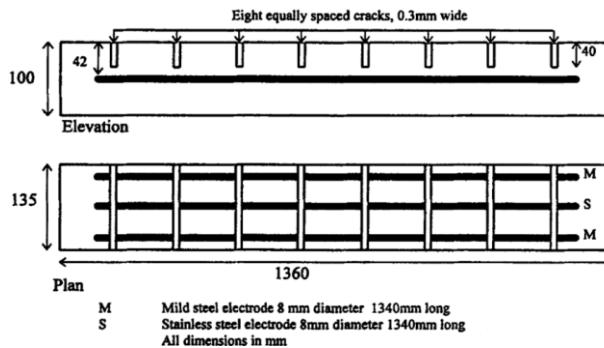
Reinforced concrete beam with artificial cracks (Arya and Ofori-Darko, 1996)
